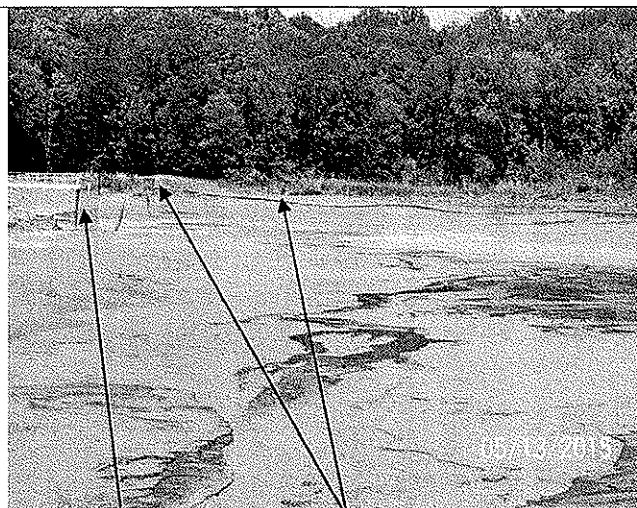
Riser structure and pumping infrastructure to pump water from Ash Pond E to Ash Pond D.
